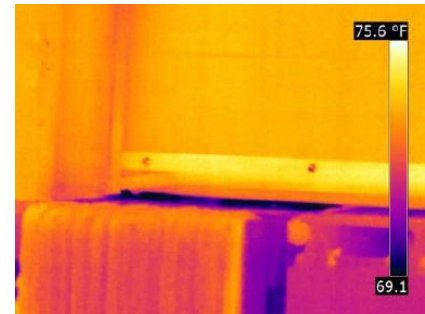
Building 35 - Thermal Image of Air Exfiltration Under Door
